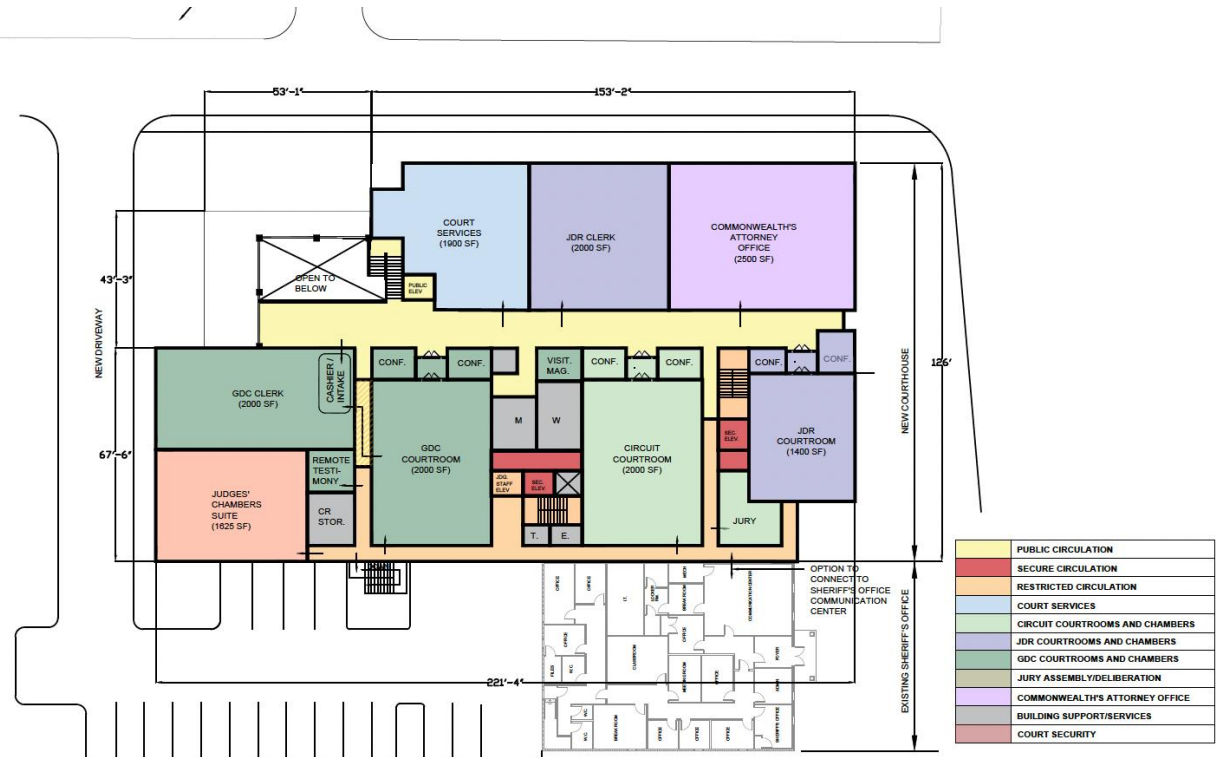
Option 3 - New Courthouse (Connected to Sheriff’s Office) First Floor
